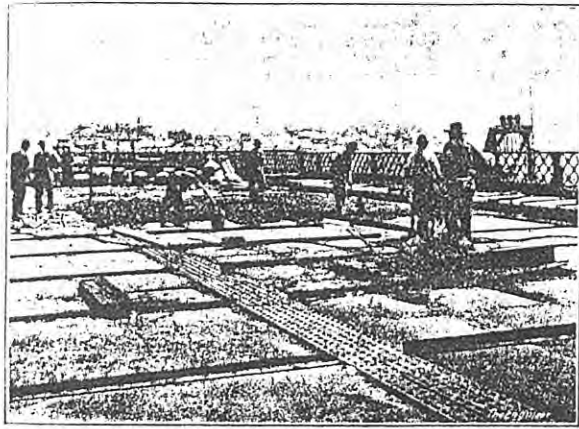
COKE-CONCRETING DECK OF SWING SPAN
